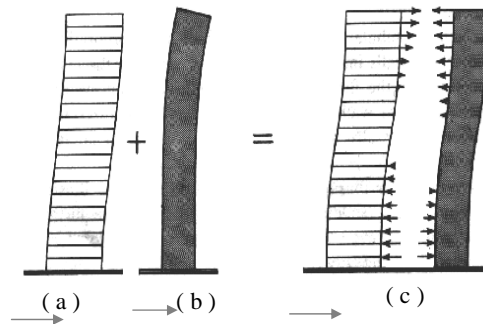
(a) Deform shape of frame; (b) Deform shape of shear wall; (c) Deform shape of combine frame + shear wall
